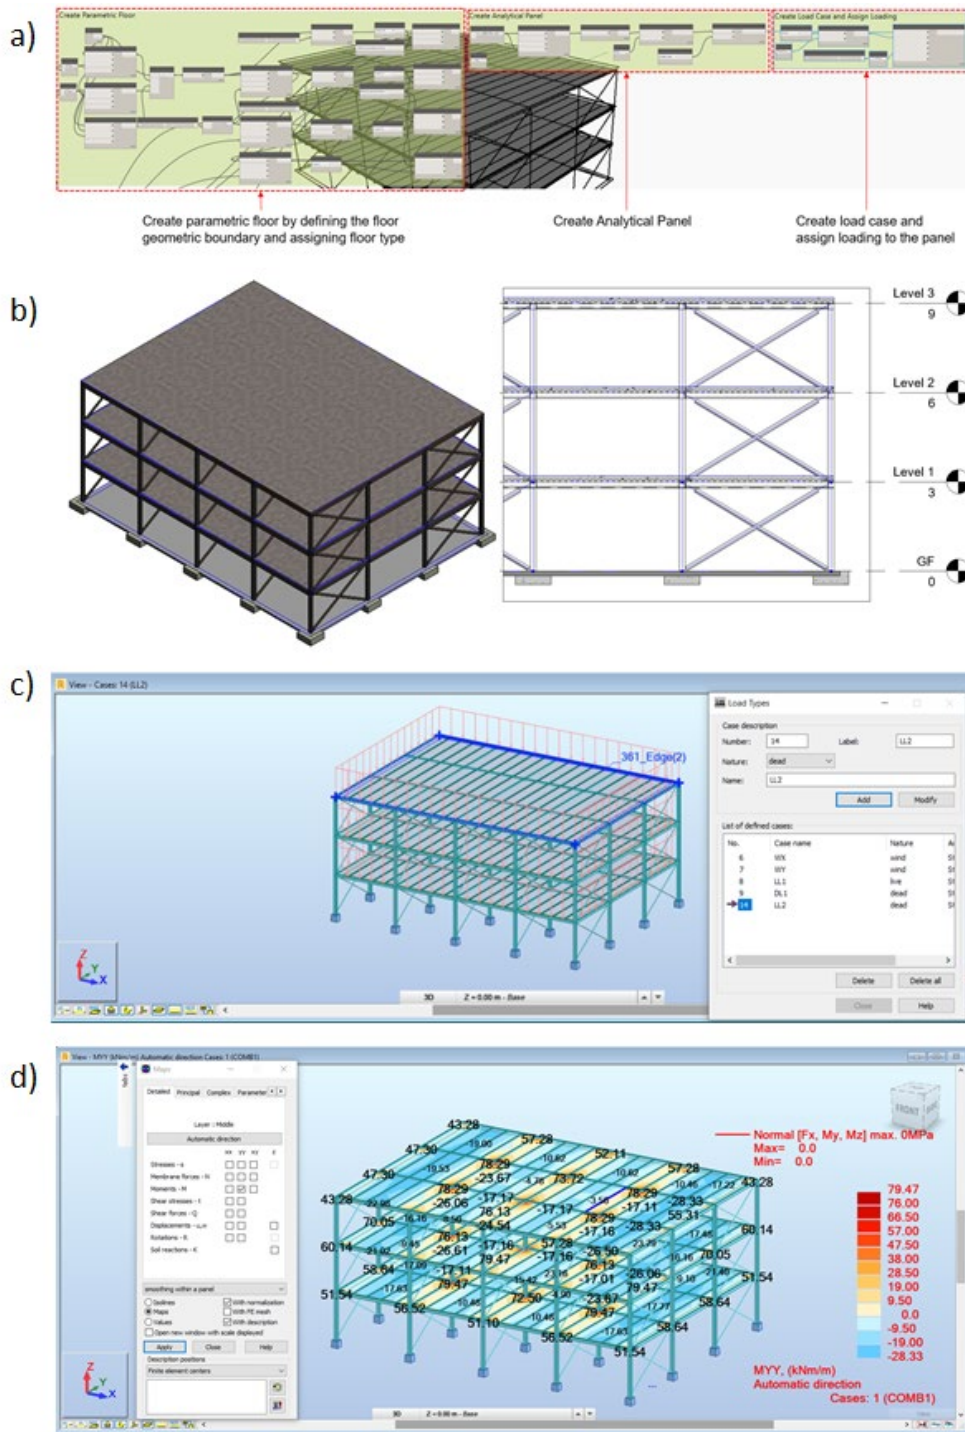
Parametric modelling workflow of a multi-storey steel frame building with the steel deck floor system: (a) parametric process in Autodesk Dynamo; (b) 3D and elevation views of the BIM model generated in Revit; (c) analytical model generated in Autodesk Robot for structural analysis with the applied loading; and (d) moment distribution of the panel resulting from load combination 1.2DL+1.6LL.
